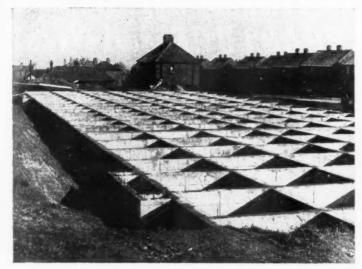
(left), 4-ft. deep cellular reinforced concrete raft foundation for school on subsidence site in Yorkshire. Fig. 3 (above), Nottinghamshire school showing deep concrete foundations of former attempts to combat mining subsidence.
